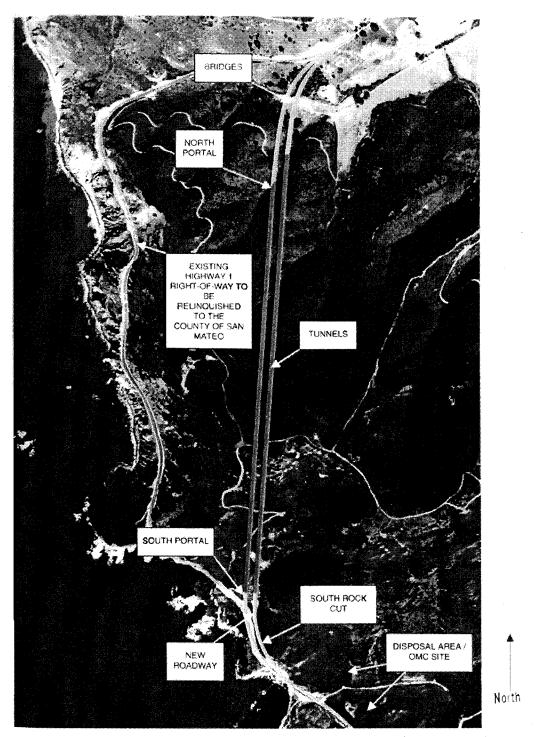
Aerial photo showing the tunneling route. During the construction phase of the project, tunnel groundwater and construction dewatering flows will be conveyed to a treatment facility at the southern portion of the project site, in the vicinity of the two yellow lines and immediately to the right of the "NEW ROADWAY" text block. During the post-construction tunnel groundwater pH treatment phase, water will be routed south to the "OMC Site" at the lower right hand corner of the picture. Upon treatment, the water will be discharged into the Pacific Ocean.
